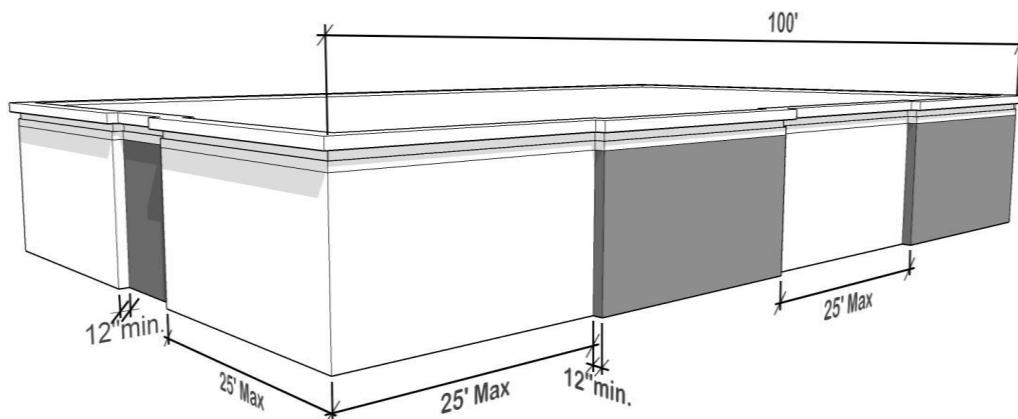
Example of vertical massing breaks using change in wall plane for a building less than 100 feet in length.
